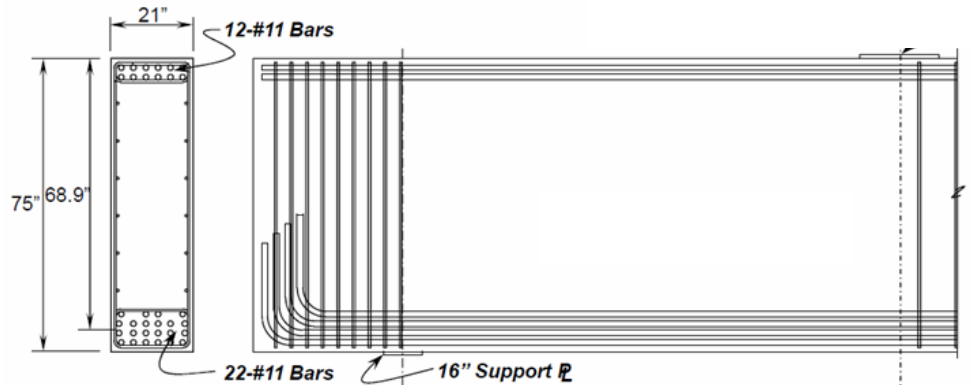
Details of cross section and reinforcements of the series IV of Birrcher's tests
